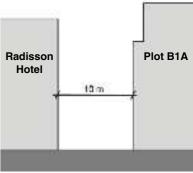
Building adjacency between The Radisson Hotel and B1A
